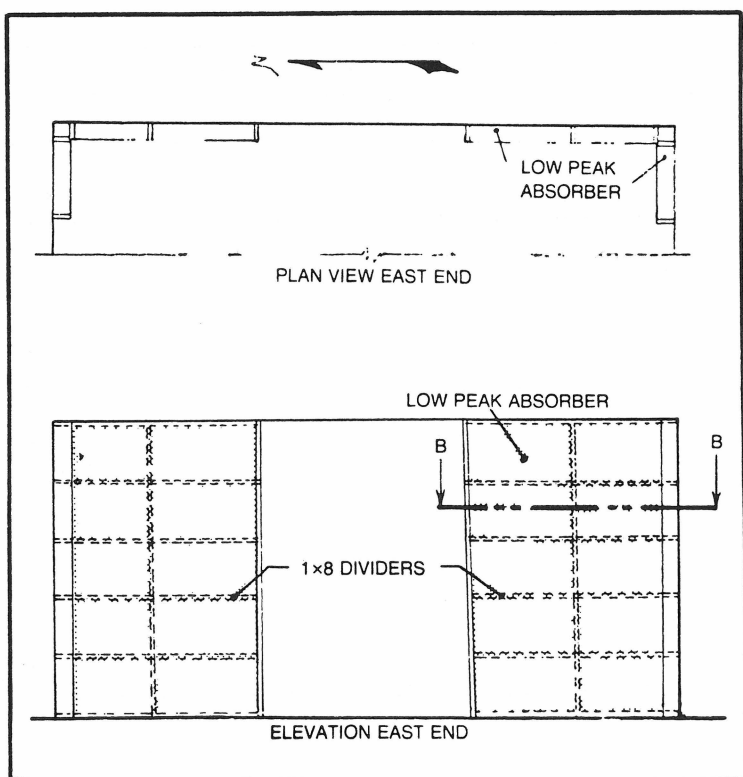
Behind the screen on the east wall is located a low peak absorber in each corner, floor to ceiling. Dividers of 1 \times 8 lumber break up the air space to discourage modes of vibration parallel to the face of the absorber.
